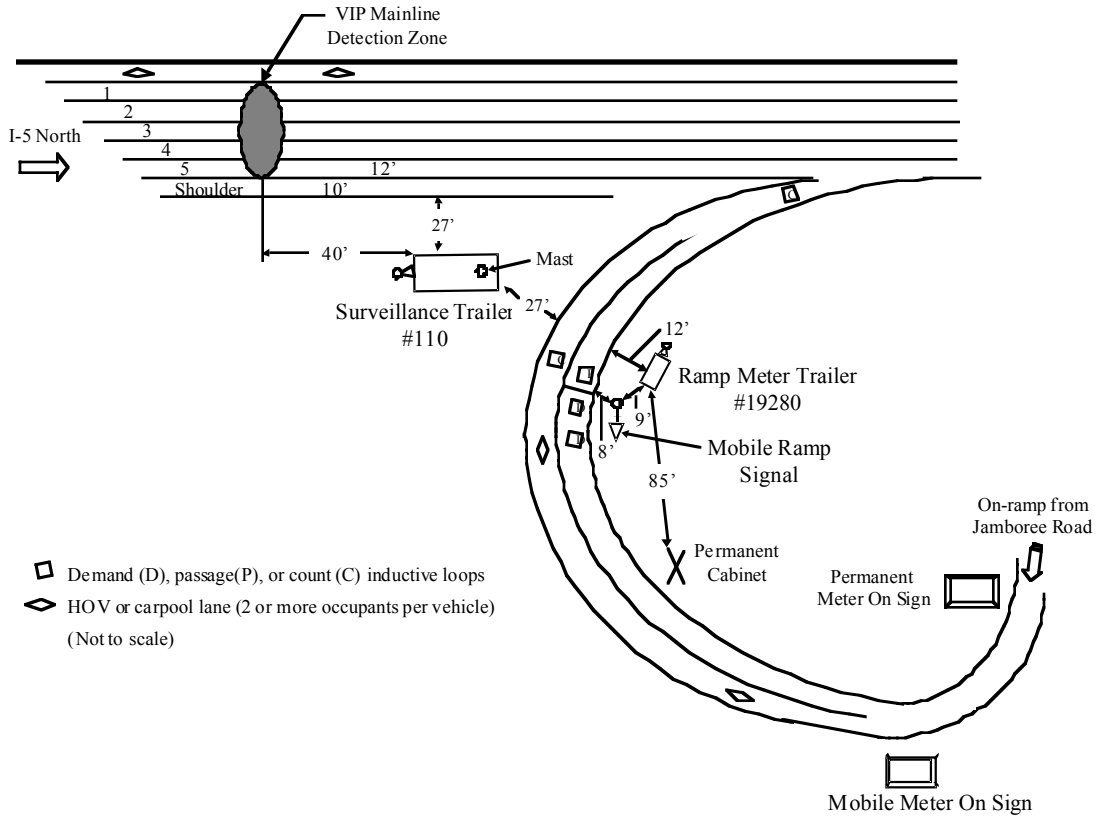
Trailer and ramp meter equipment configuration at Jamboree Road evaluation site
